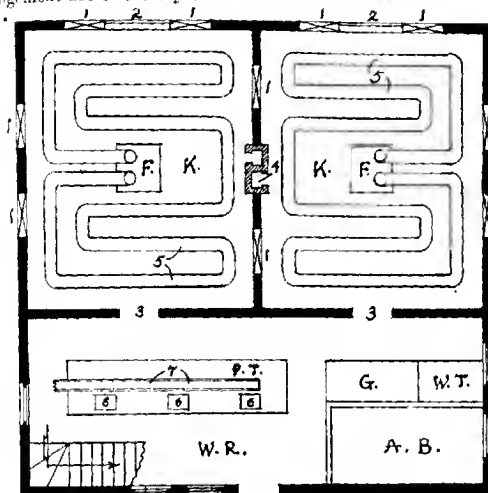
Two-kiln Evaporator, Ground Floor Plan.
